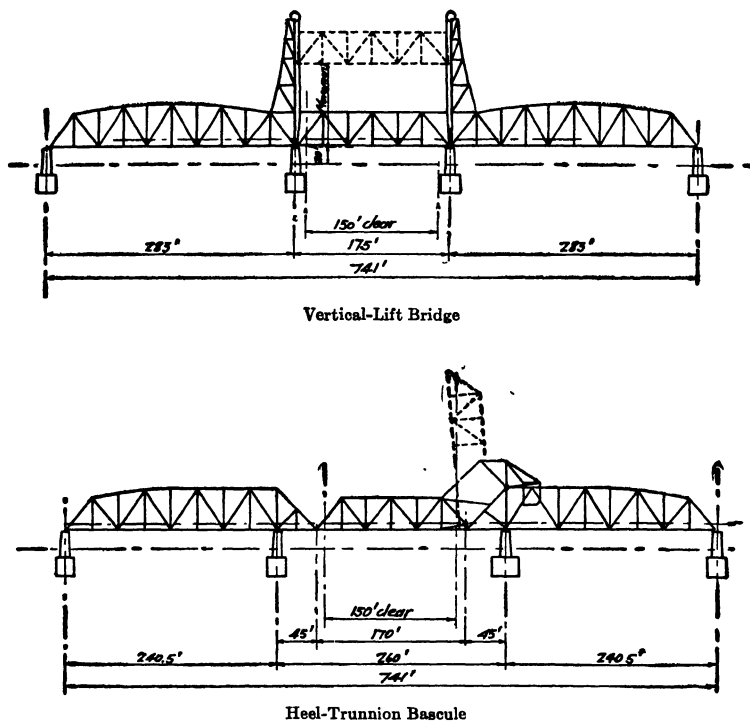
Layouts with Flanking Truss-Spans—Bascule Tower Cantilevered.
